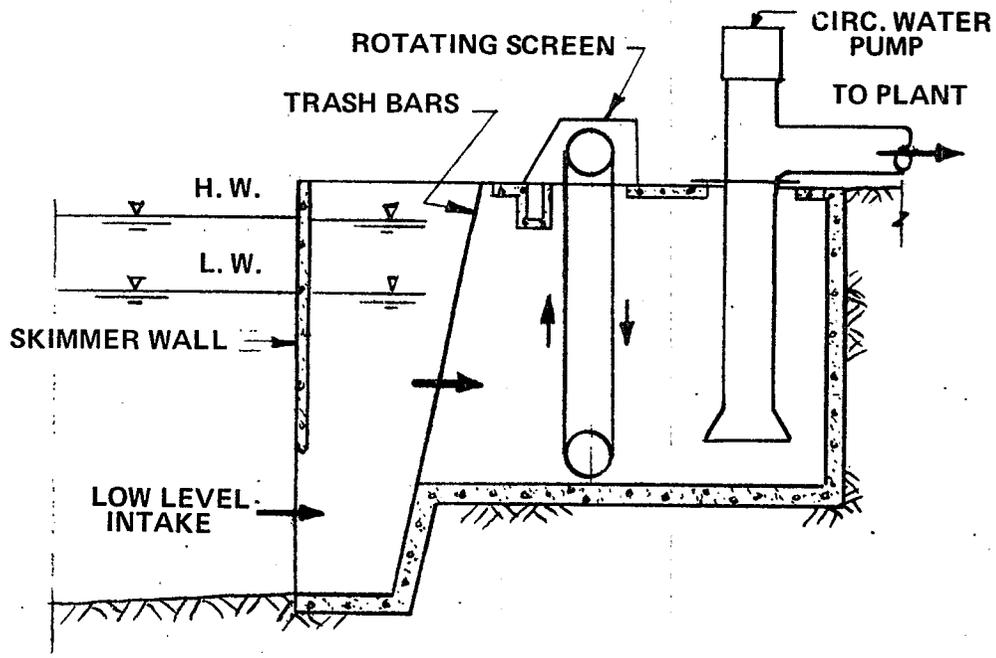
PUMP AND SCREEN STRUCTURE WITH SKIMMER WALL
